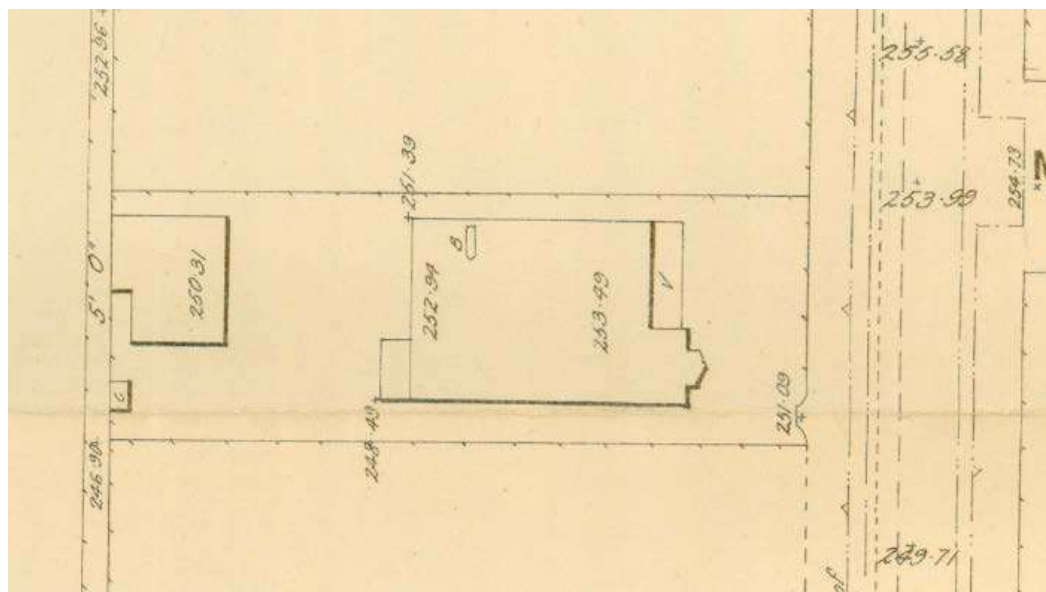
MMBW Detail Plan no. 1900, showing 13 Mangarra Road on the west side of the street in 1905 (Source: SLV).
